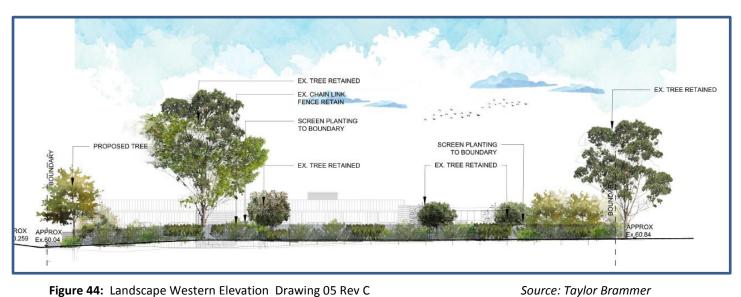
Landscape Western Elevation Drawing 05 Rev C
